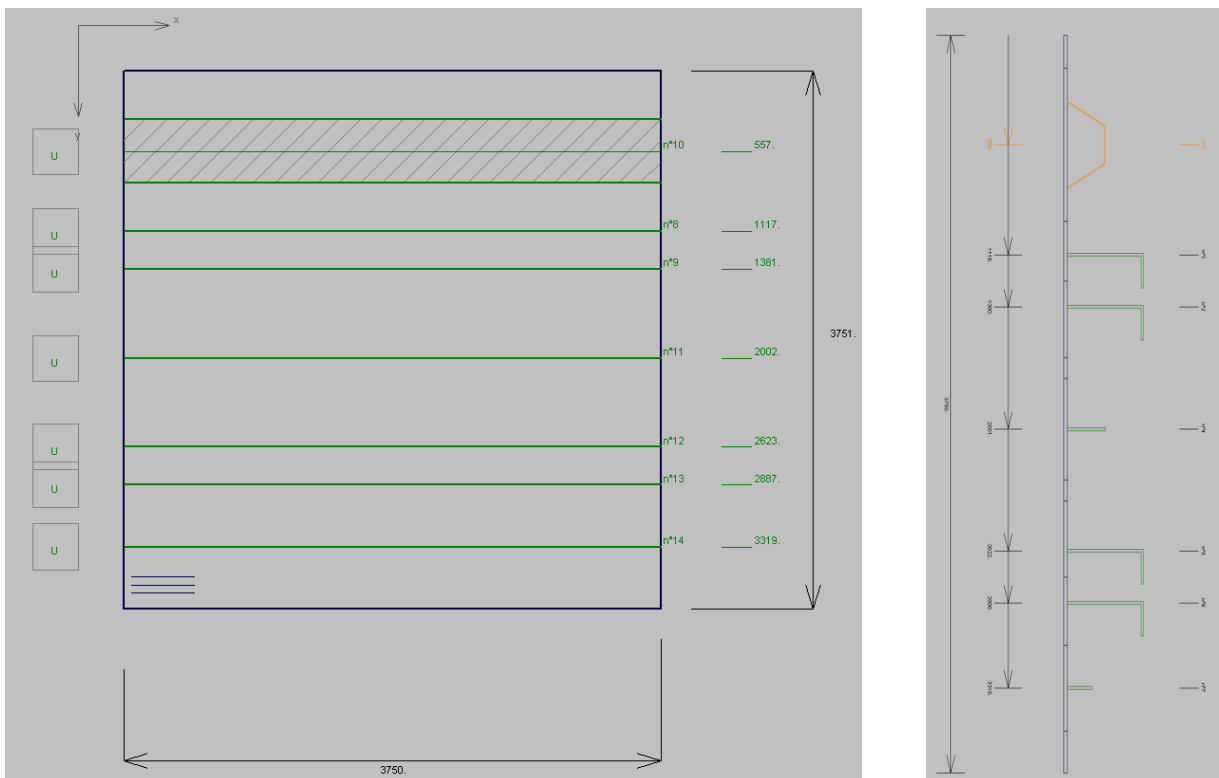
Illustration of a plate panel 1 of the railway girder including dimensions
